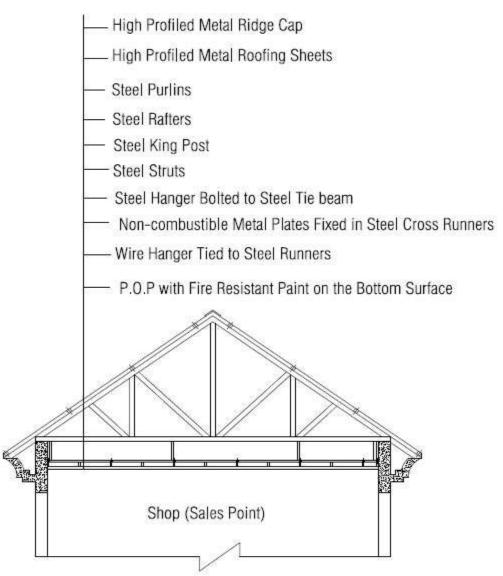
Section of a proposed shop building revealing composite ceiling arrangement connected to the roof structural members.
